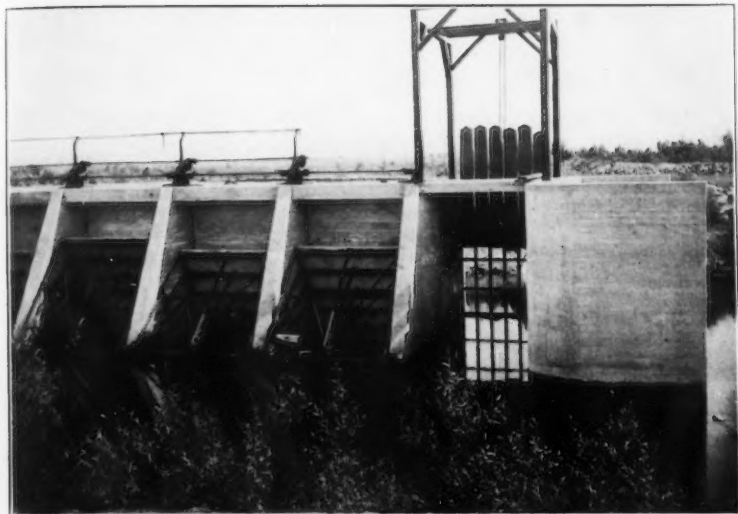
CONCRETE HEAD-GATE, JULY 10TH, 1906, SHOWING DETAILS OF GATES, NAVIGATION PASS, AND GATE AND ABUTMENT AT RIVER END.
